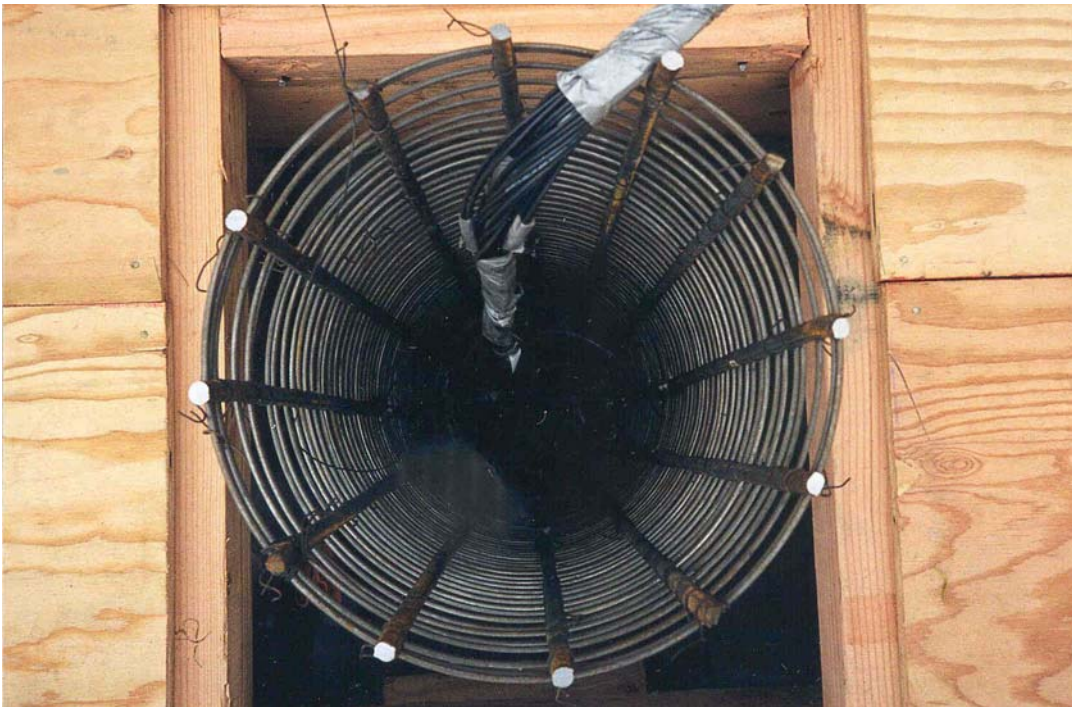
Construction of formwork to support the top slabs, while curing the footings.
